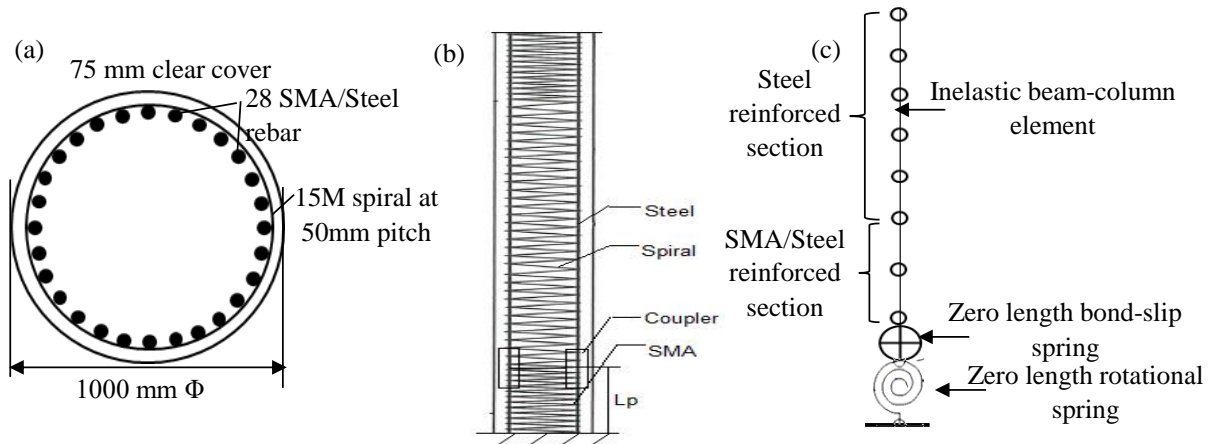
(a) Cross section, (b) elevation and (c) finite element model of SMA-RC bridge pier
